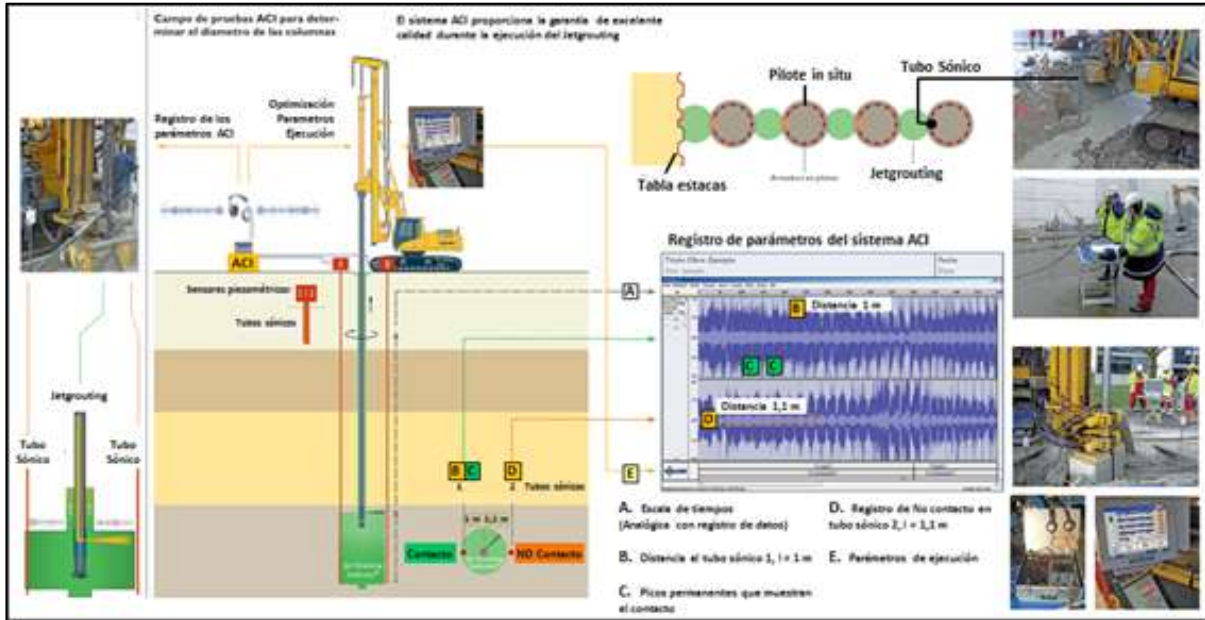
Jet grouting column diameter control by ACI-Acoustic Column Inspector System (Vukotić et. al. 2016).
